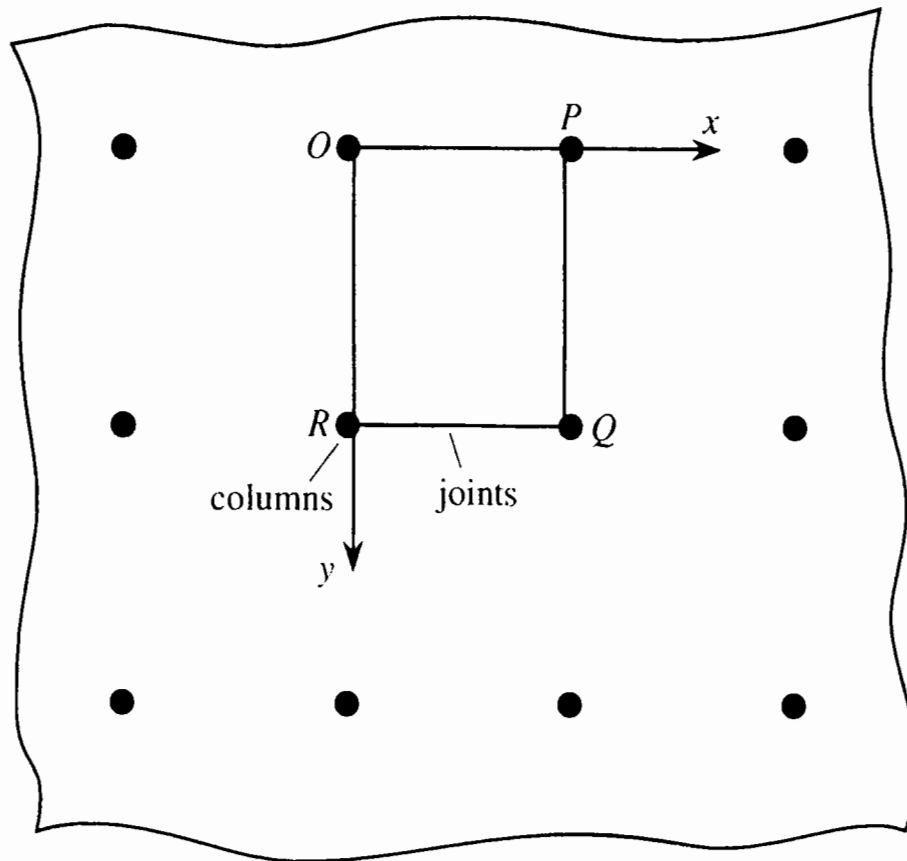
Flat Slab with Joints along Column Lines forming a Slab Supported at the Corners
